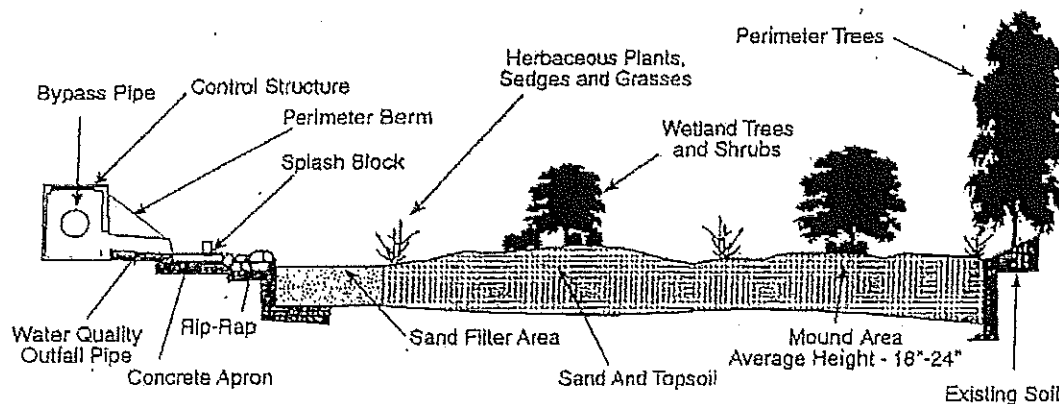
Bioretention cross section: Runoff from large storms (greater than a 1-year storm) is bypassed through the main drainage system. Runoff from small storms is diverted at the control structure (manhole). The energy of the stormwater flow is dissipated by the splash block or the rip rap. The stormwater is filtered through an open sand filter. Excess stormwater is treated in the bioretention area.
